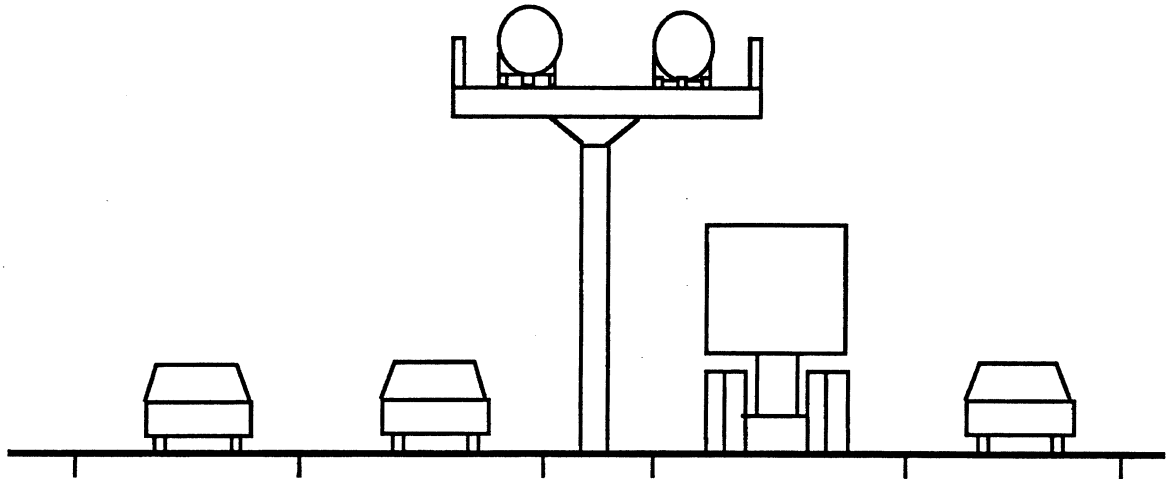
illustrates another type of elevated roadway concept for the commuter car. Elevated sections could be constructed in the median of divided highways where at-grade highway expansion has reached its maximum limit due to a variety of right-of-way constraints. The cost advantages of building elevated road sections in this design concept are dramatic for commuter cars. Estimates range from one-half to one-quarter the cost to construct comparable exclusive lanes for standard vehicles.
